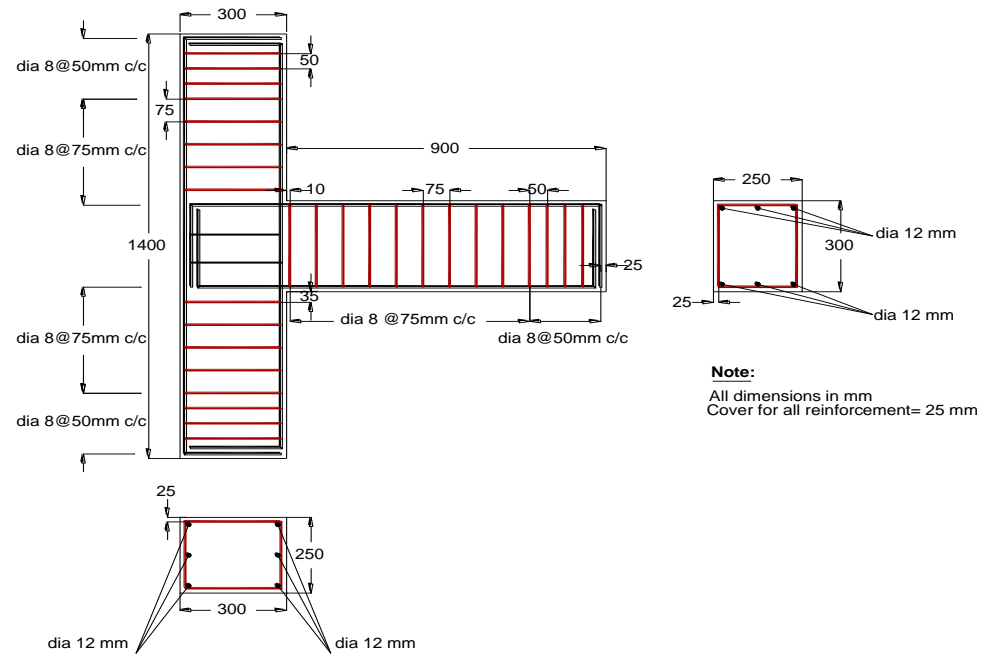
BCJ-S-12MM specimen reinforcement details and dimensions
